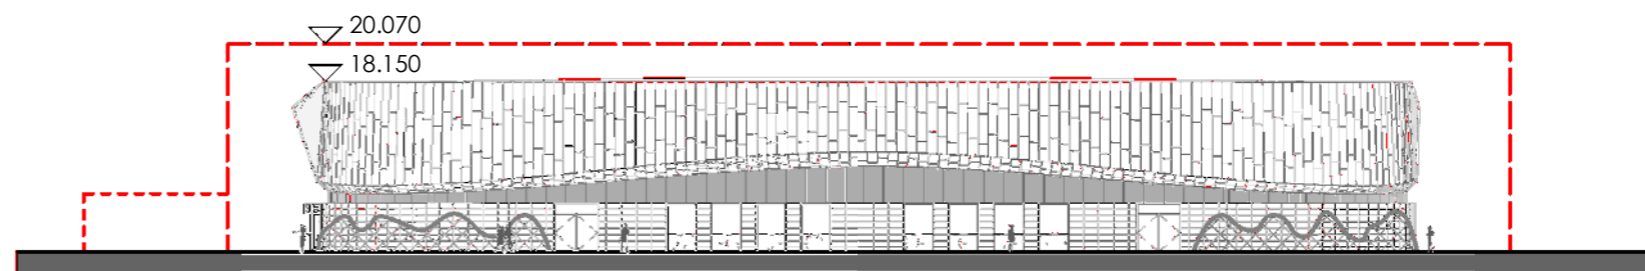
Comparative scale of existing LVIC building (in red) with proposals - south east elevation to Lea Bridge Road
